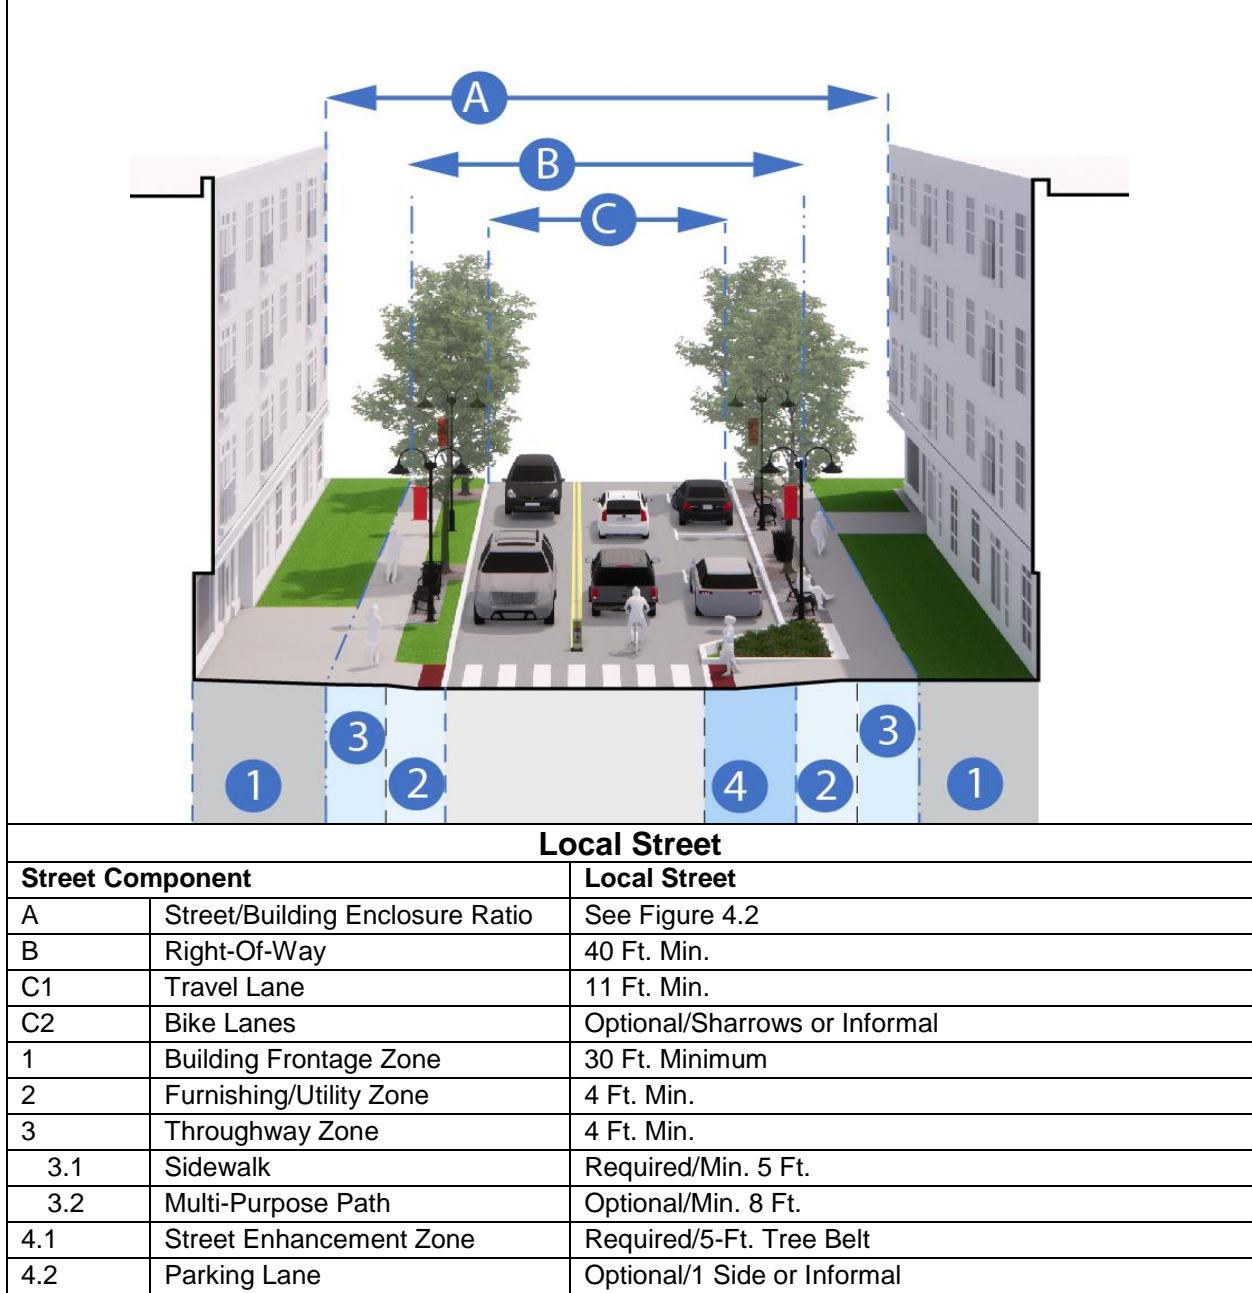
COMPLETE STREET TYPES AND STANDARDS
